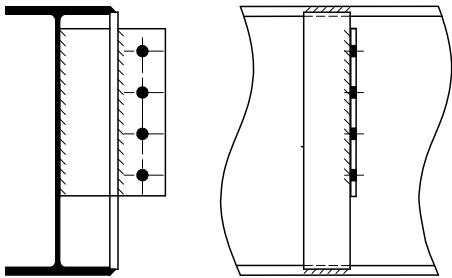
Possible stiffening arrangement for long fin plates to supporting beam
